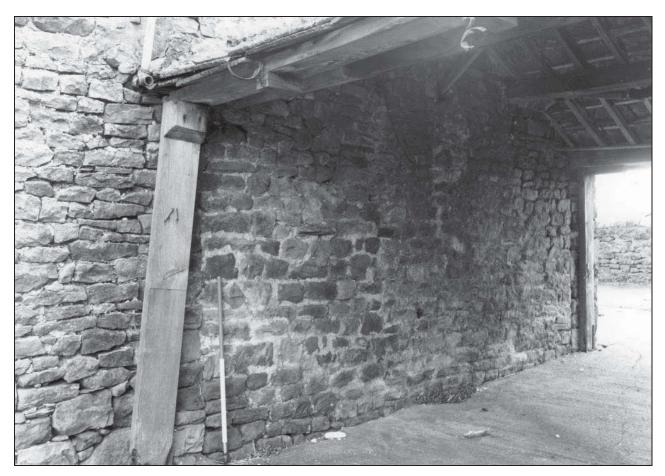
Cart shed: the east side, showing straight joints in west side of earlier barn
